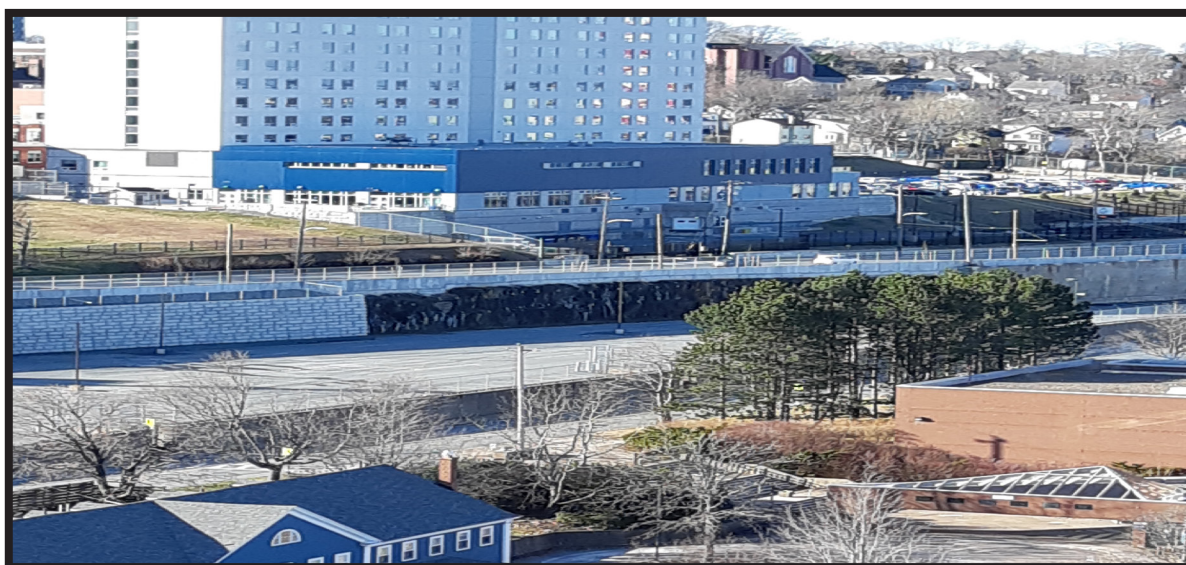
Photograph of a section of the 1870s ironstone wall still intact.
